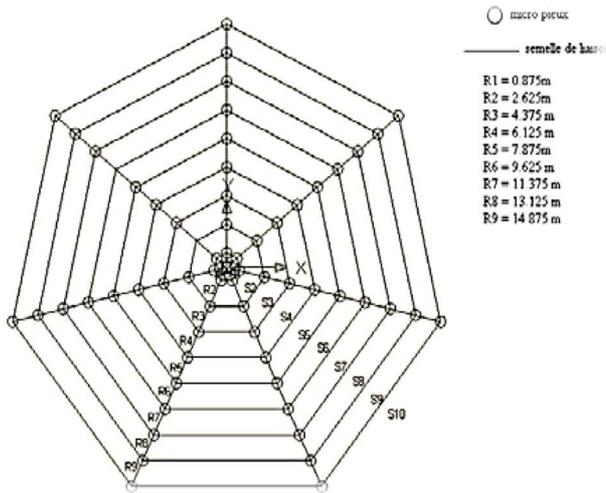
Layout of reinforcing micropiles embedded in reinforced concrete connecting beams (Simpro 2010)
